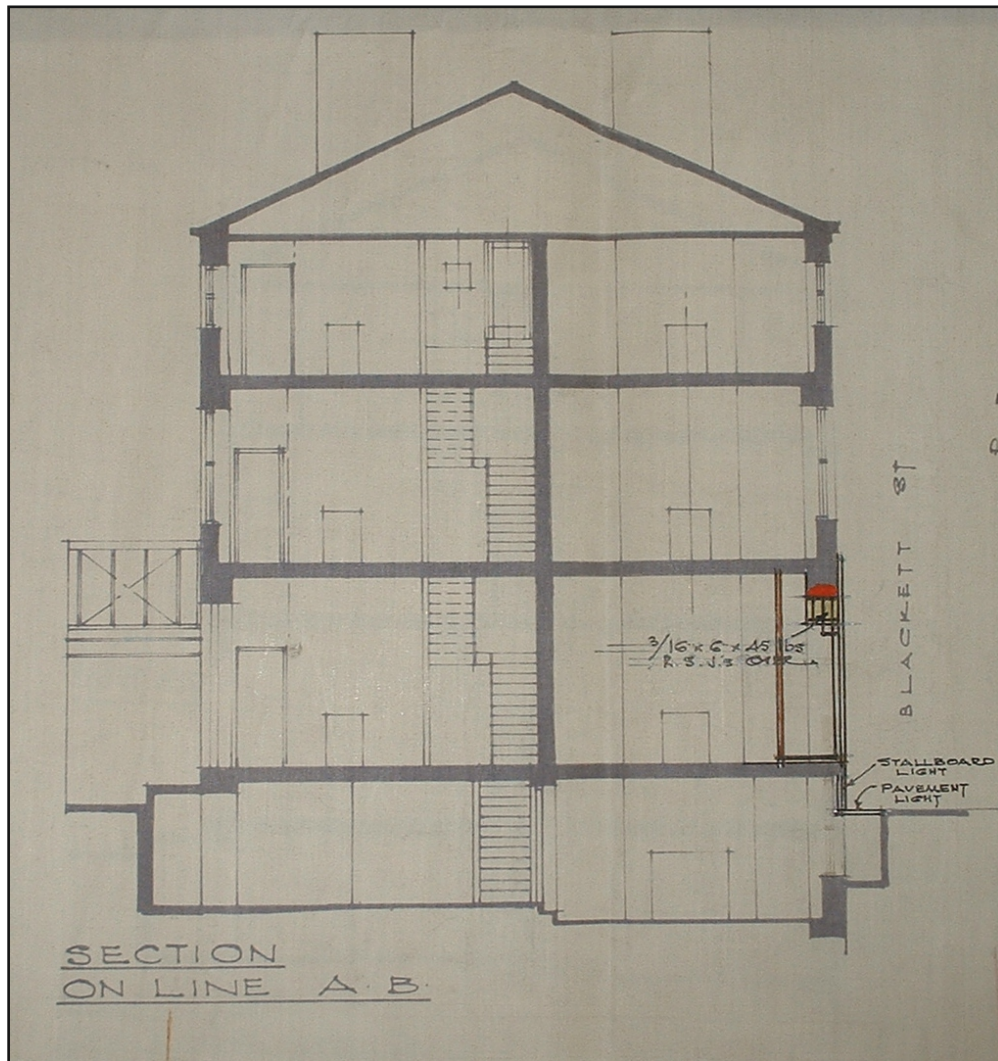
Elevation drawing of Nos. 108-110 Newgate Street c.1895, showing plans for the addition of cellars (TWM T186-16435).
